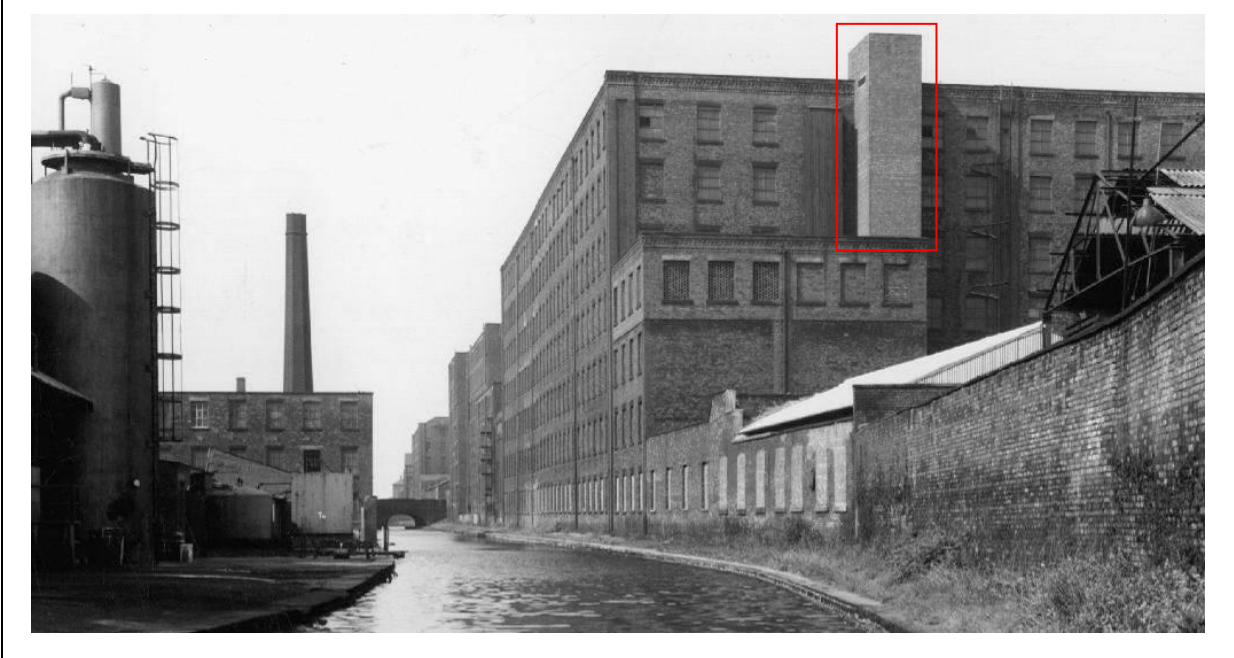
1960, showing the recently constructed hoist tower raising above the roof level of the east wing. (Source: Manchester Local Image Archive)
